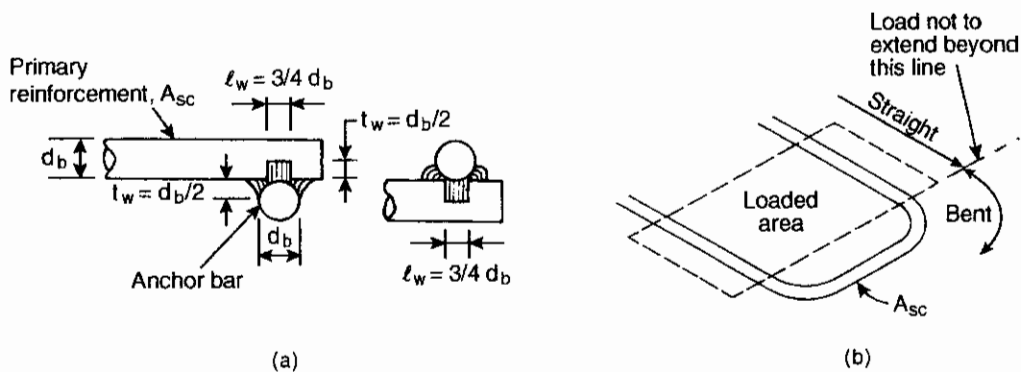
Anchorage Details Using (a) Cross-Bar Weld and (b) Loop Bar Detail
